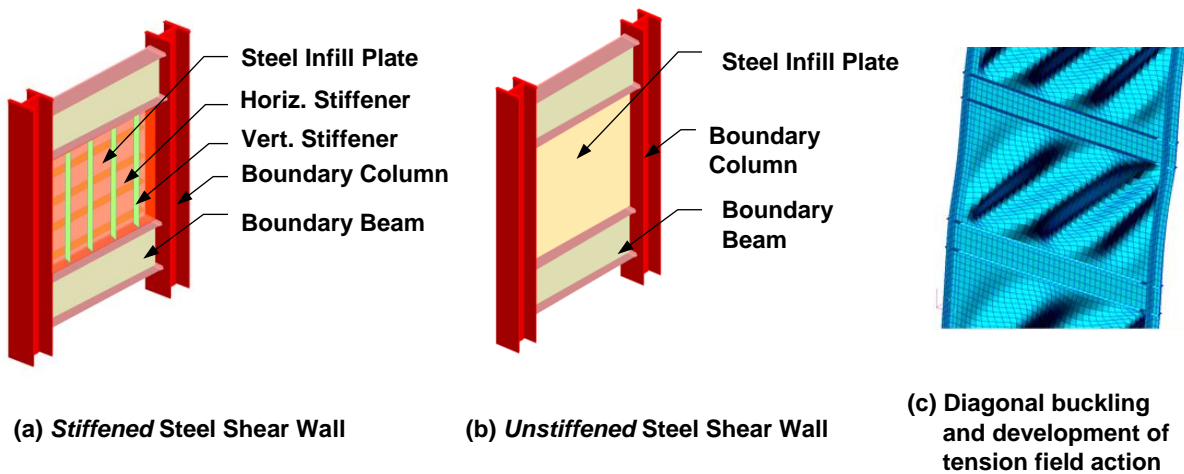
Typical stiffened and unstiffened steel shear walls
